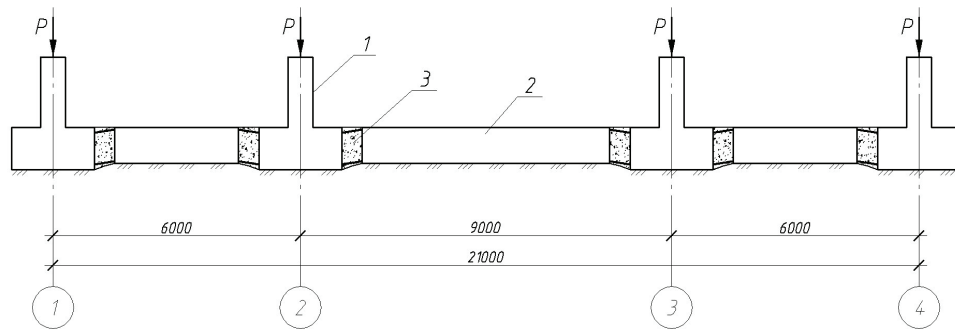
Cross section of the slab foundation: 1 – the support element; 2 – the span element; 3 – temporary deformation seams filled a monolithic concrete.
